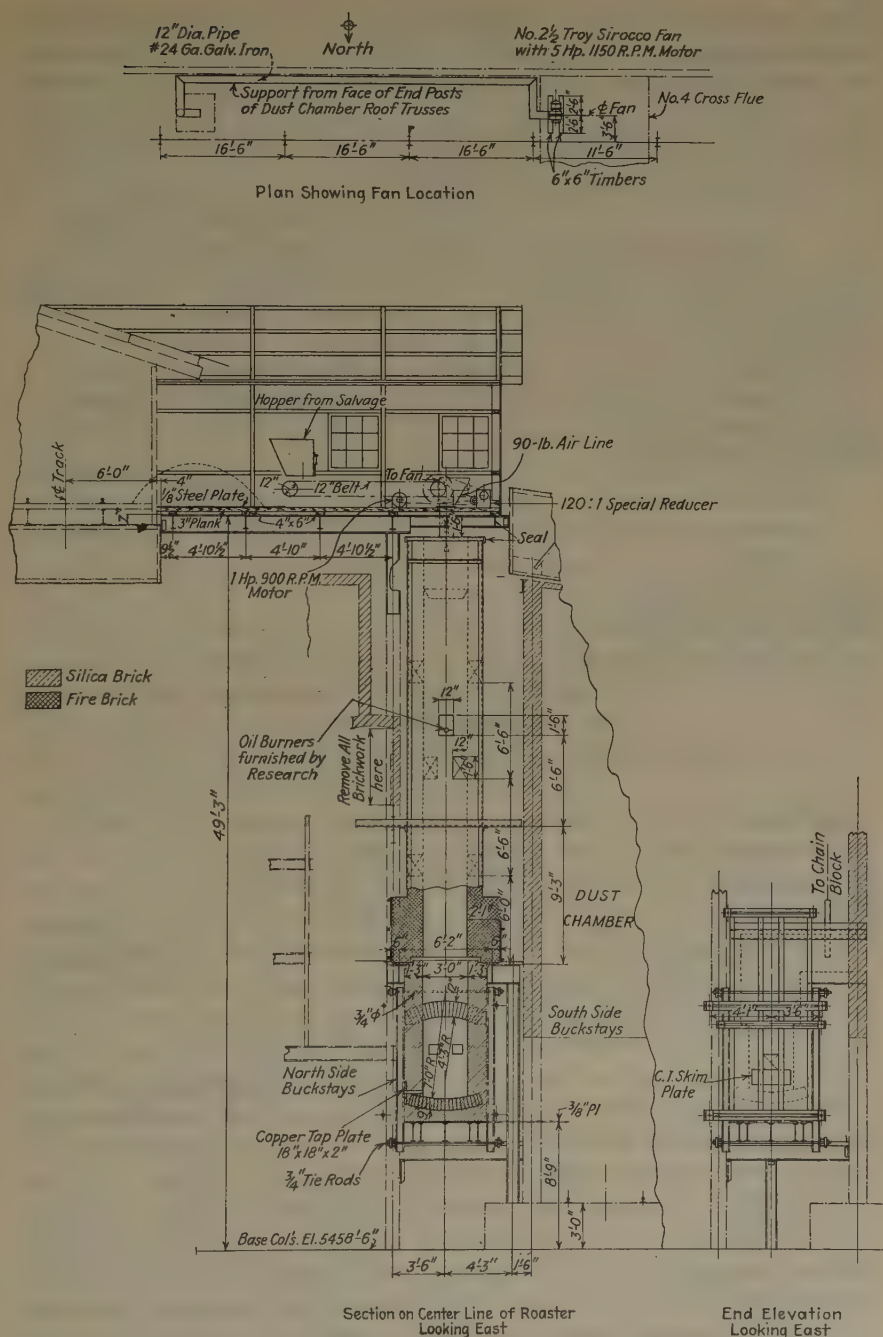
ROASTING SHAFT COMBINED WITH REVERBERATORY FURNACE.
